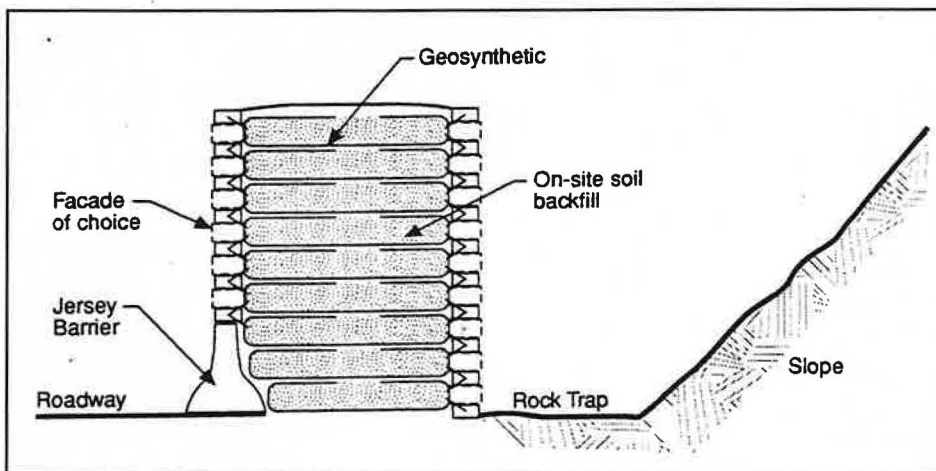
Rockfall barrier constructed with soil wrapped in geofabric reinforcement and timber protective facade (10).
